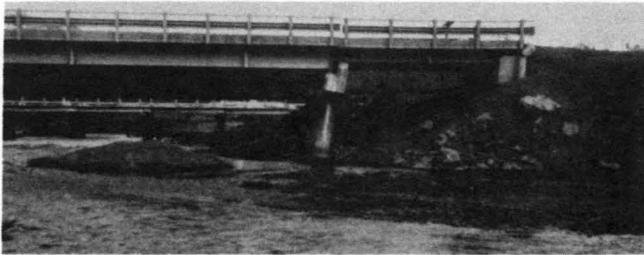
Highway bridge over Resurrection River that was compressed by lateral spreading during the 1964 Alaska earthquake. The compression thrust the deck into and fractured the abutment wall, and ground displacement carried the adjacent pier streamward, fracturing that element at the ground line [after McCulloch and Bonilla (4)].
